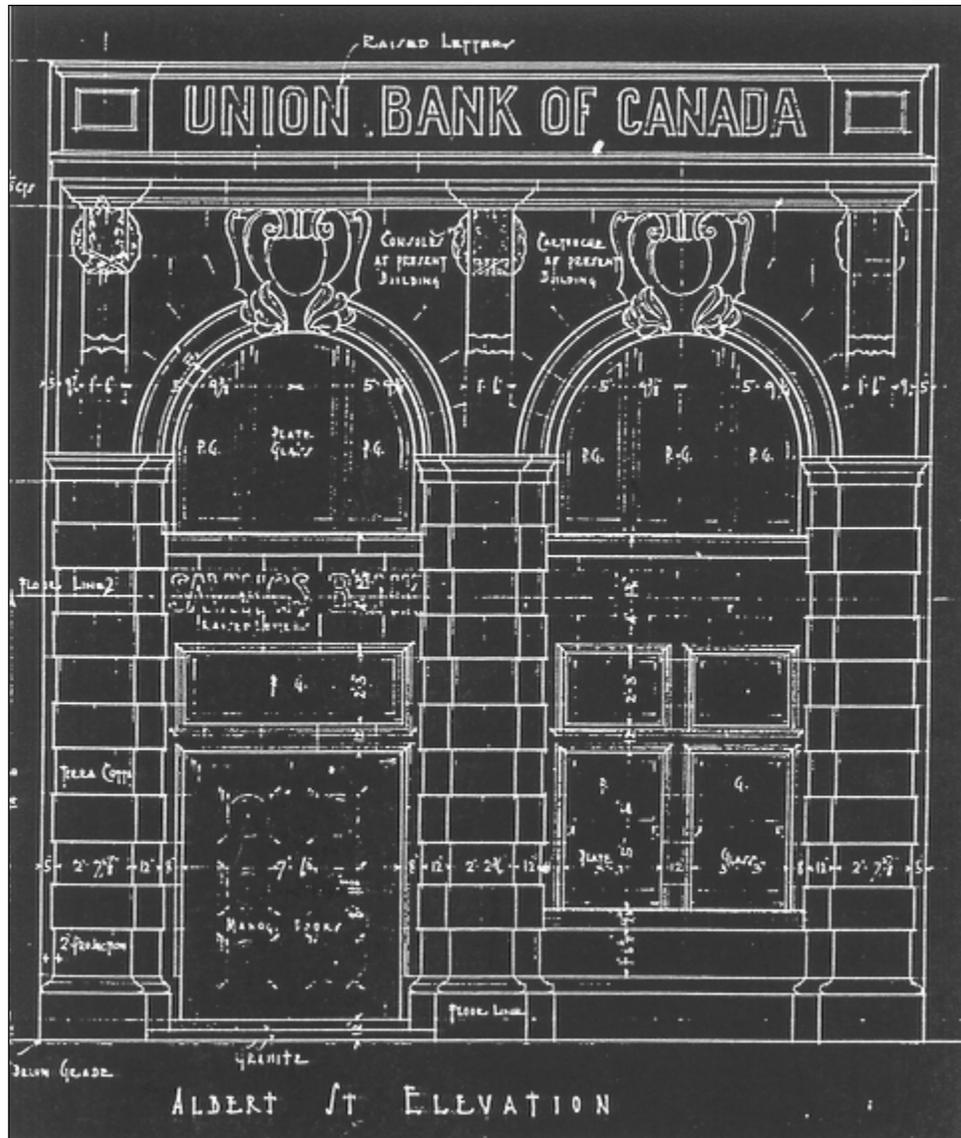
Architect’s plans of Union Tower Annex, “Albert Street Elevation,” 1921. (Courtesy of City of Winnipeg Archives, Plan # 947/1921.)
